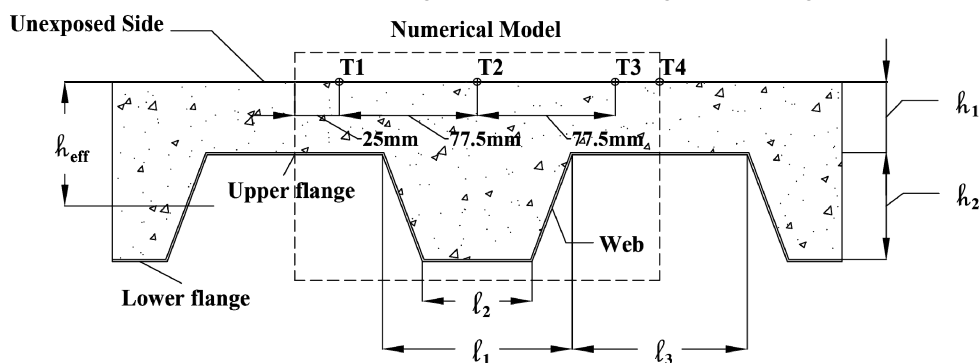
Geometry for the slab with trapezoidal steel decking (adapted from [1]).
